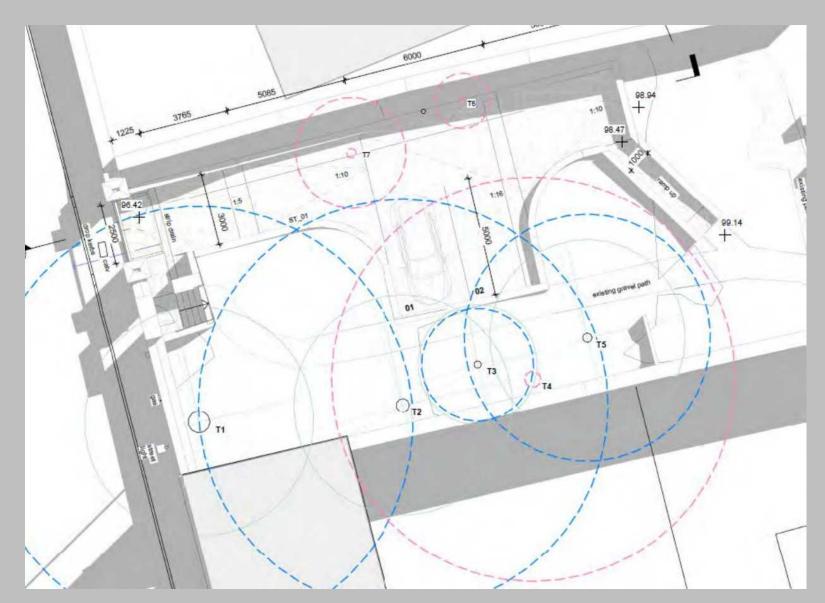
Positioning of car parking to limit impact on Root Protection Areas of retained trees.
